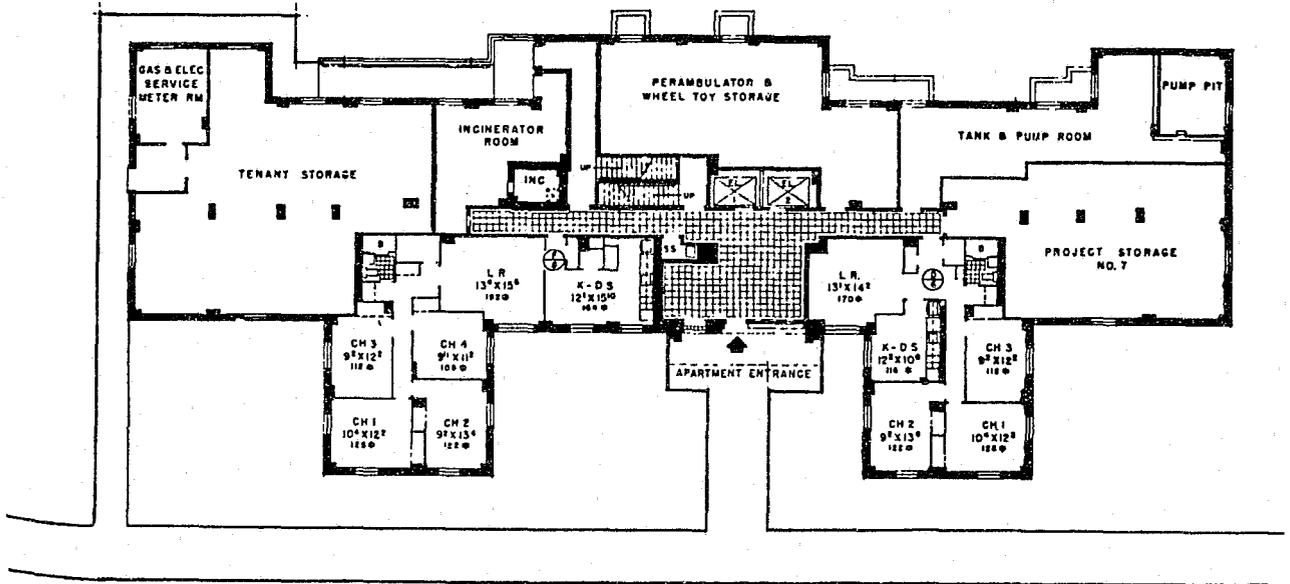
Highbridge Houses, New York. Floor plan.
